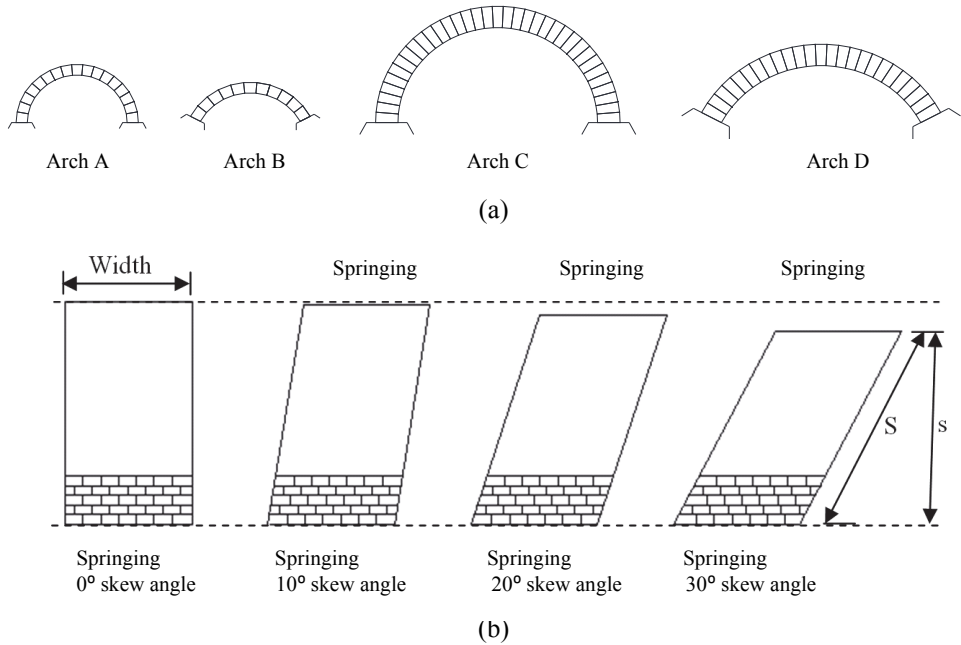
Geometry of the arches studied: (a) elevation view; (b) plan view of a typical arch
